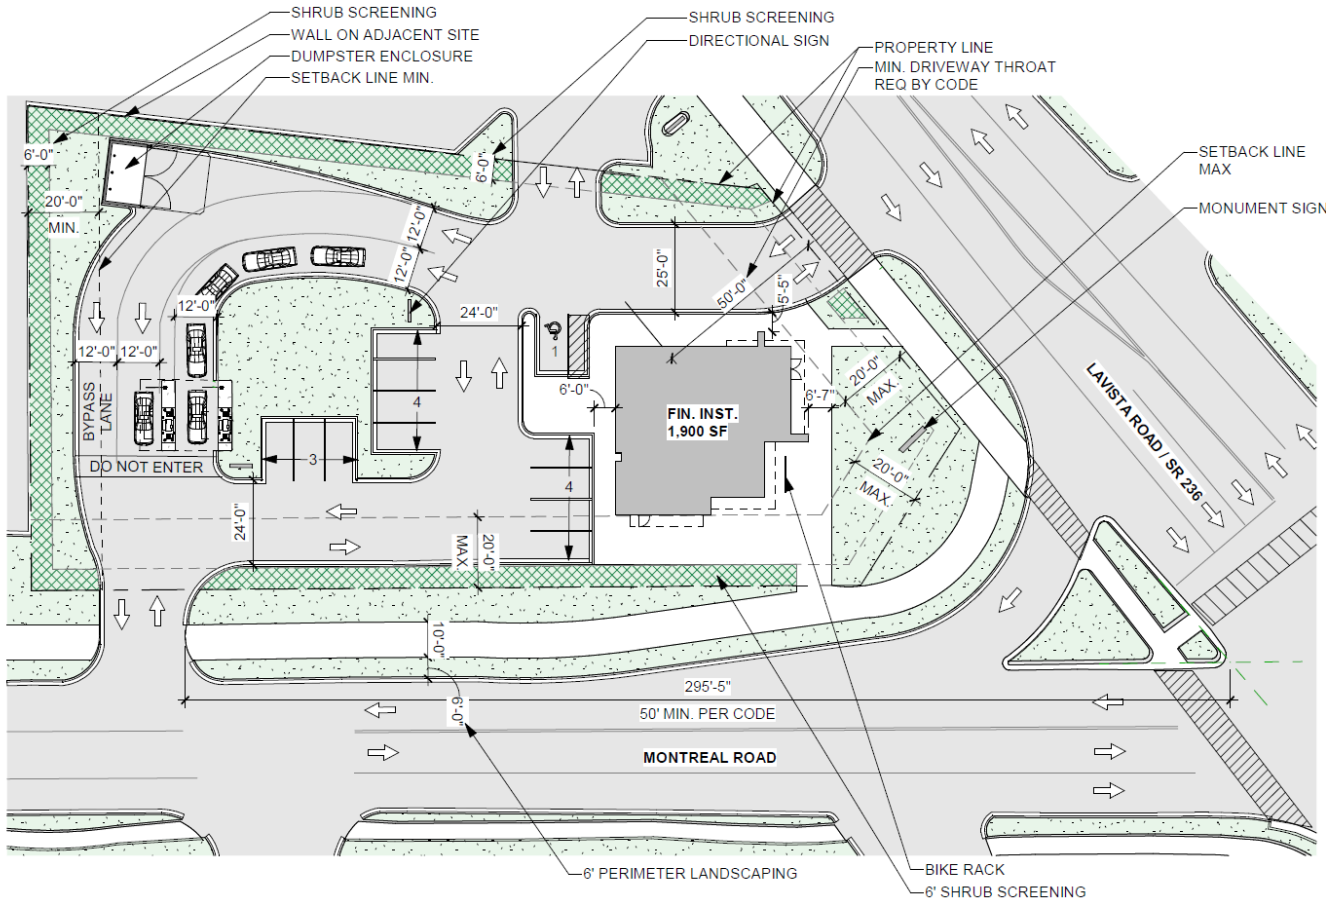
Proposed site plan showing 0' and 20' front setbacks along Lavista and Montreal Roads.
